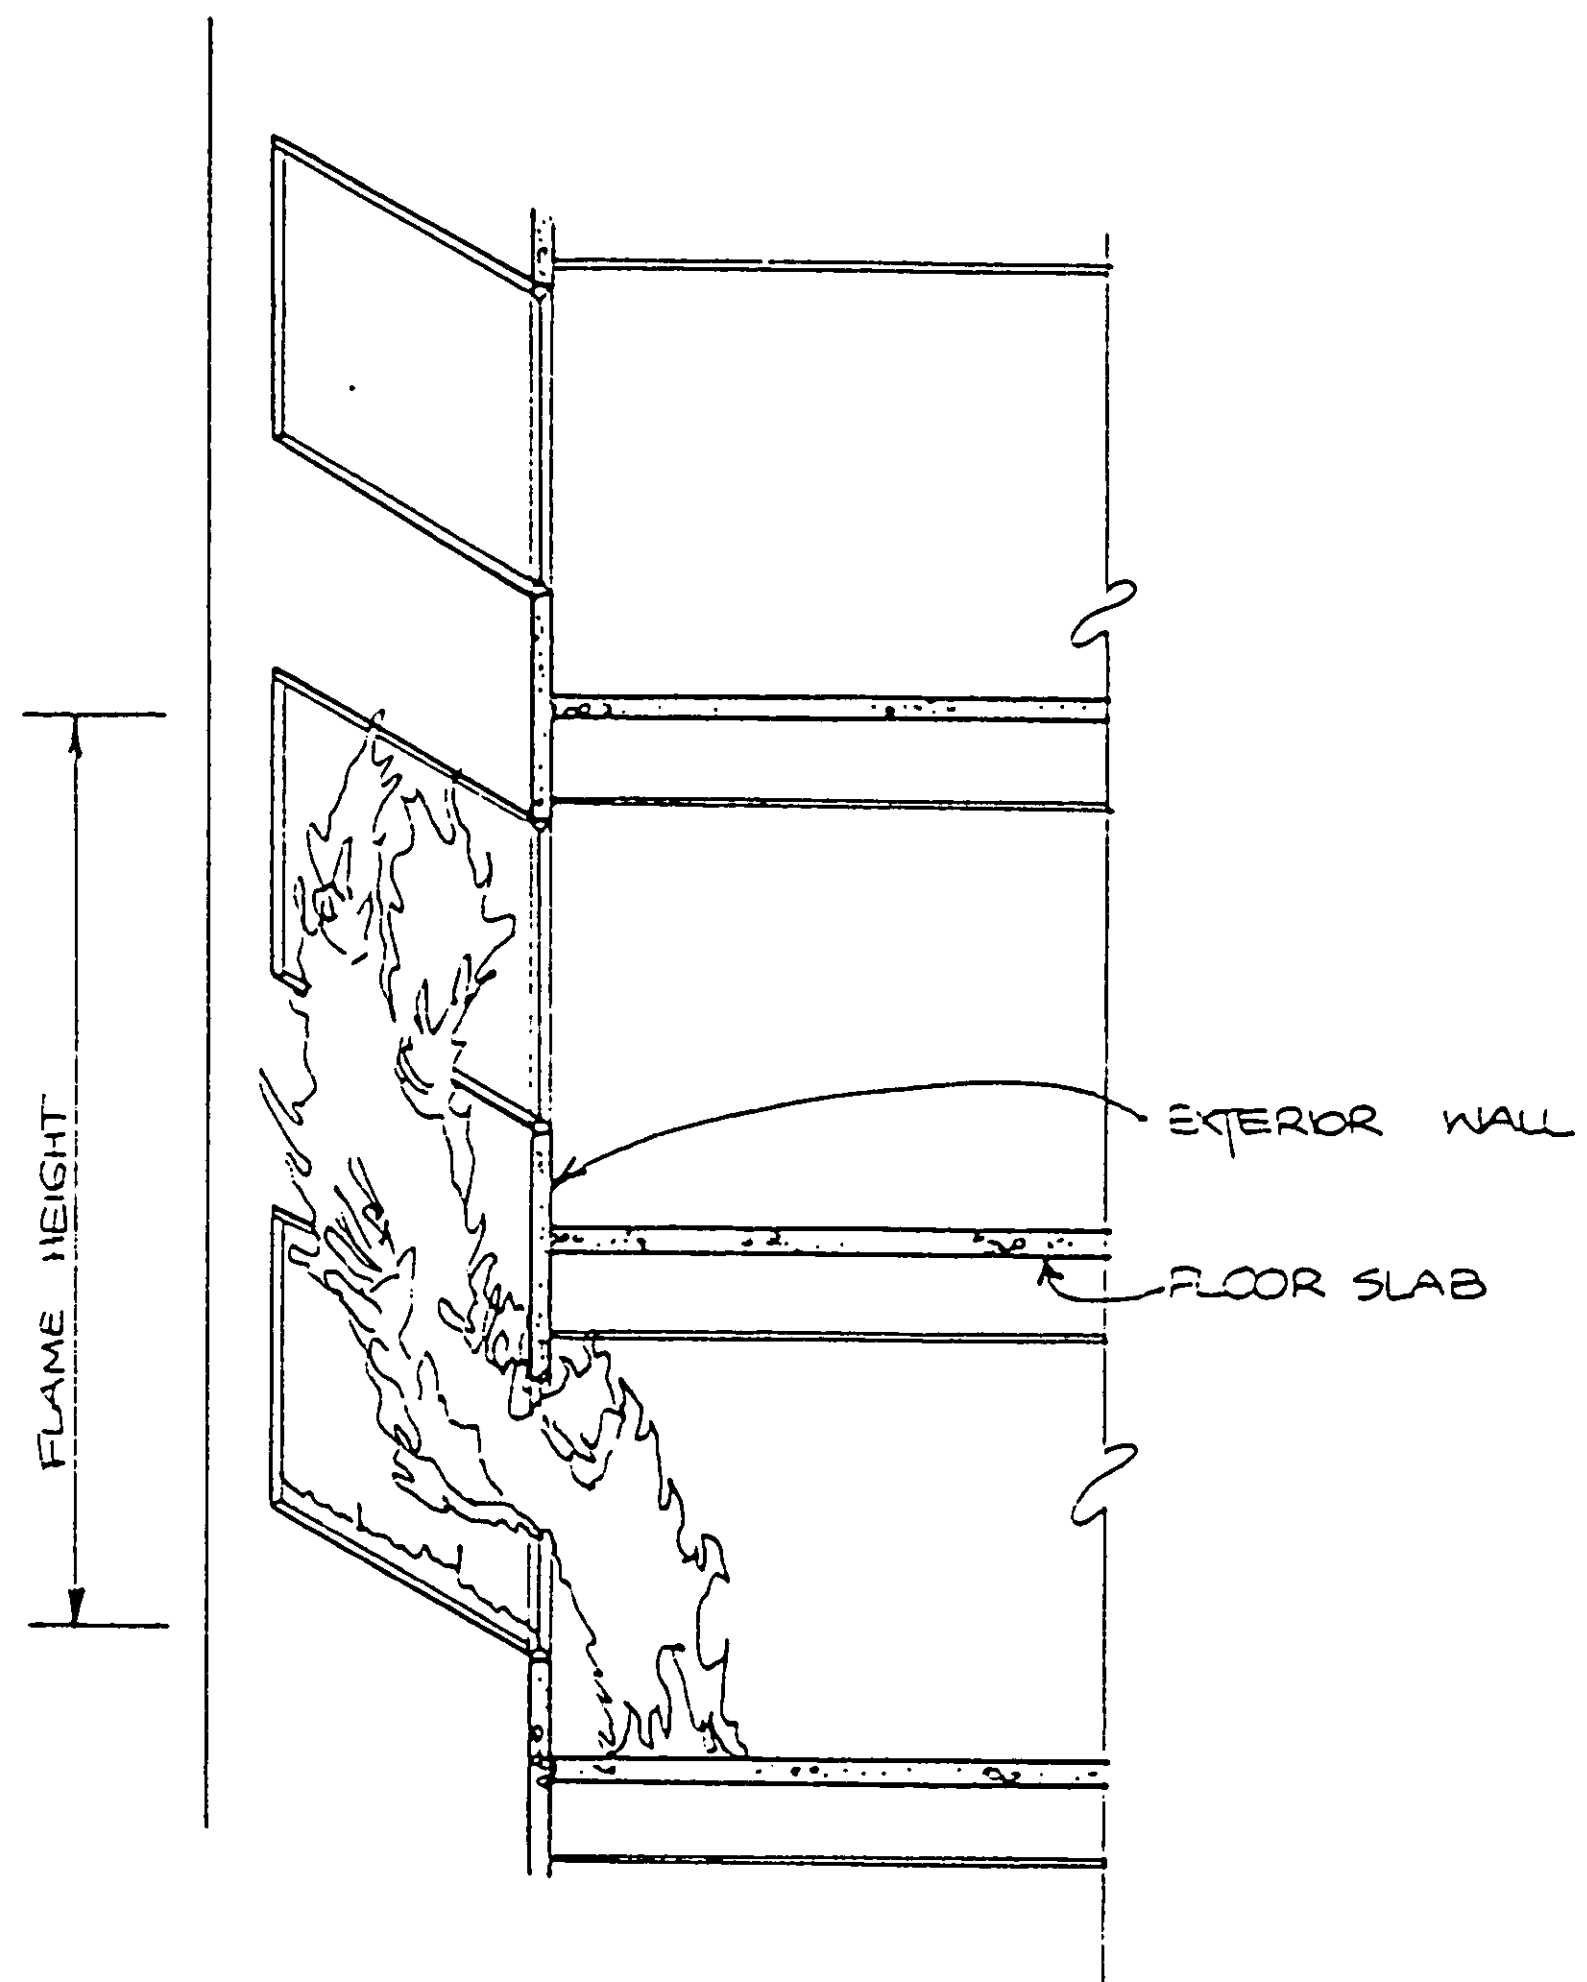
EXAMPLE OF FIRE EXPOSED TO FACADE.
